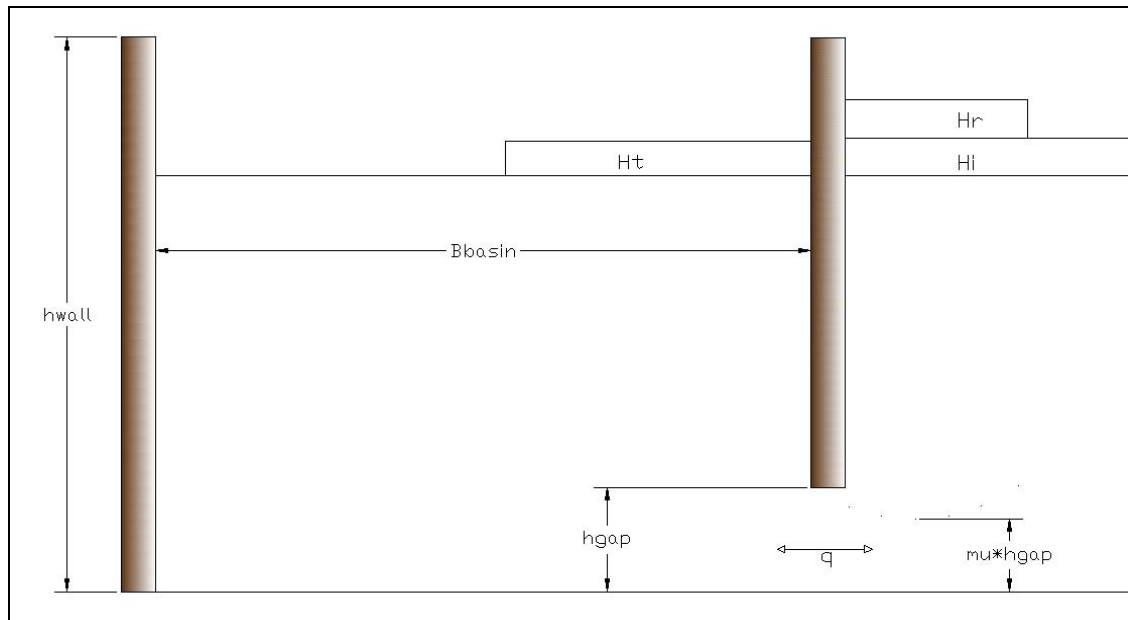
Frame work basic model; perforated vertical wall in front of vertical backwall
